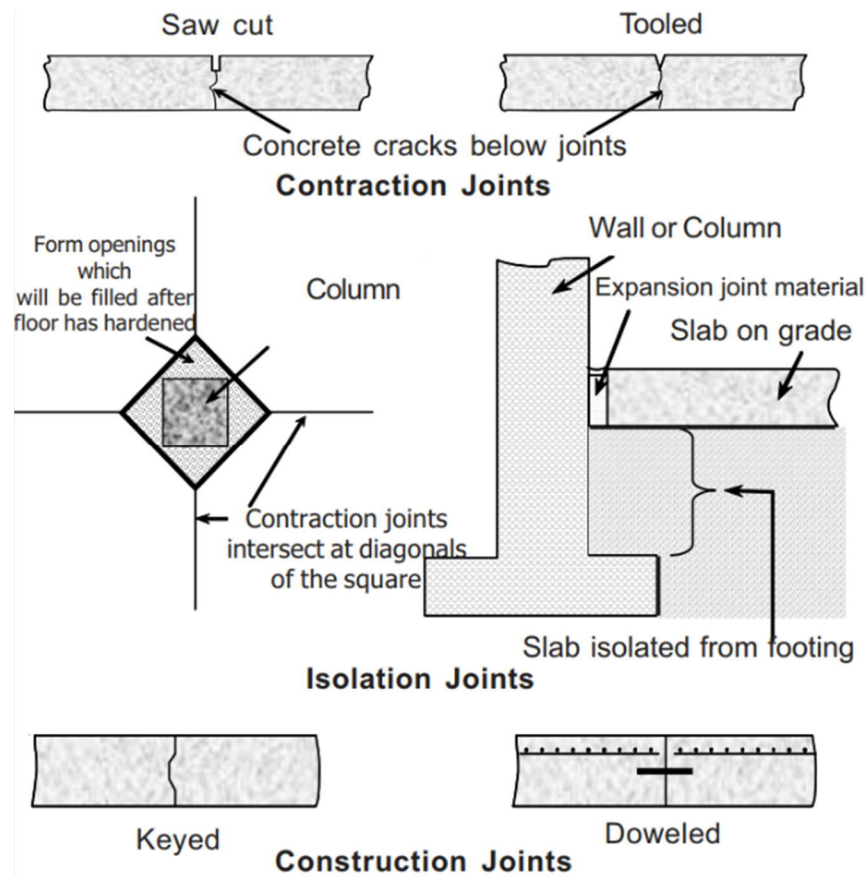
Joints in concrete slabs (National Ready Mixed Concrete Association, n.d.)
